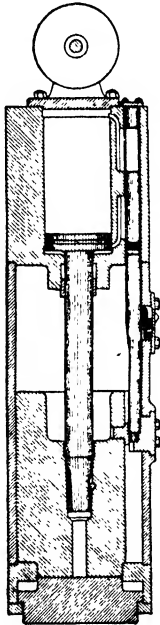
McKiernan-Terry Steam Pile-hammer.
